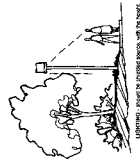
TREE CANOPY LIGHTING (NOT TO SCALE) - SUBJECT TO CITY OF ALBUQUERQUE PLANNING DEPARTMENT REVIEW
